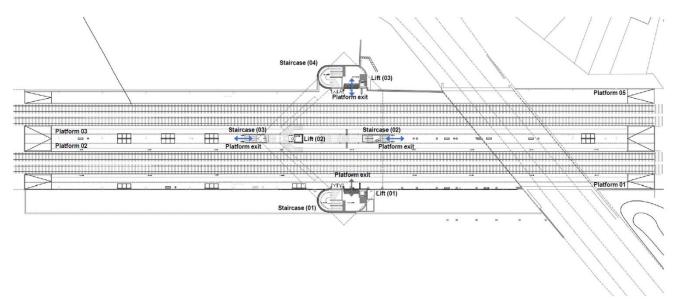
Park West & Cherry Orchard Station. Platform level plan.
